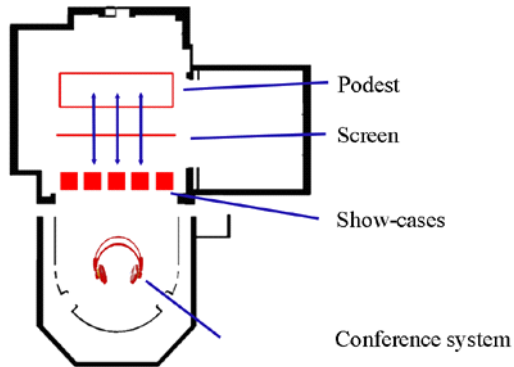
Floor plan of «Parsifal02» at Schauspielhaus Graz.
